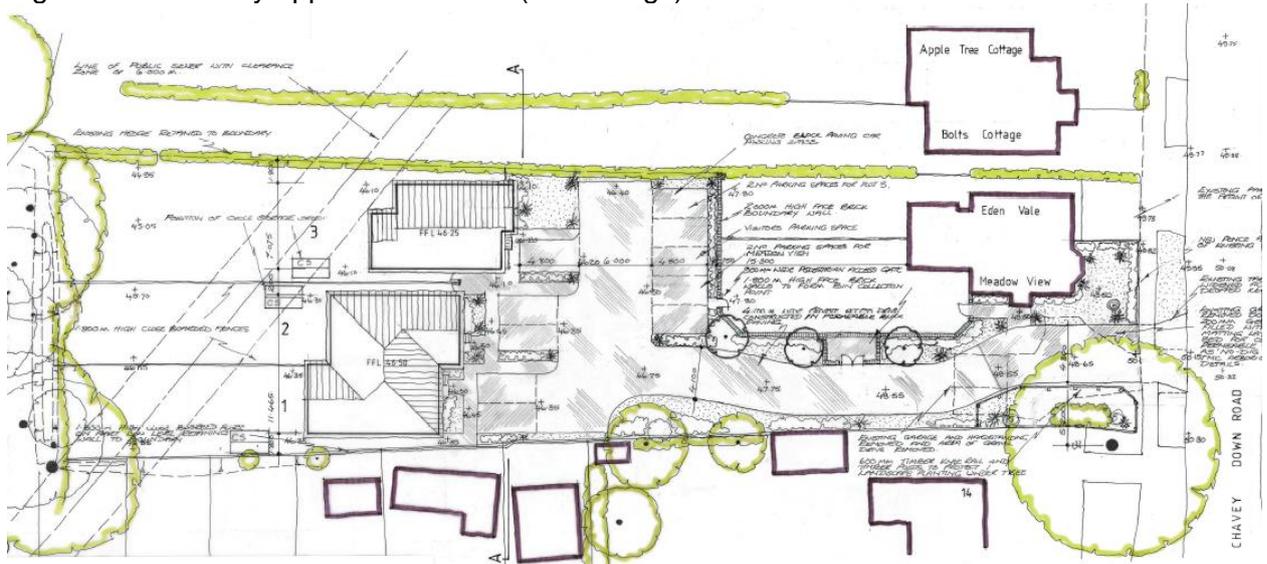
Current proposal: site layout for 4 dwellings (Highlighted parking spaces are allocated to Meadow View fronting Chavey Down Road)
